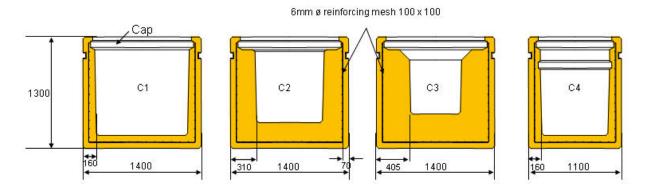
Cross sections of types C1, C2, C3 and C4 reinforced concrete drums (dimensions in mm) (after [8]).
